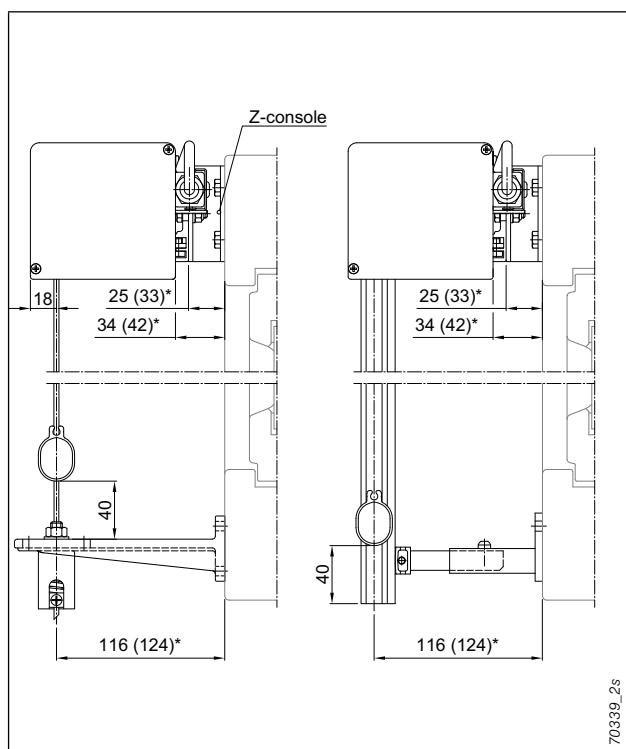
Right rolling blind (also available as left rolling blind), wall installation, cable guidance, guide rail
